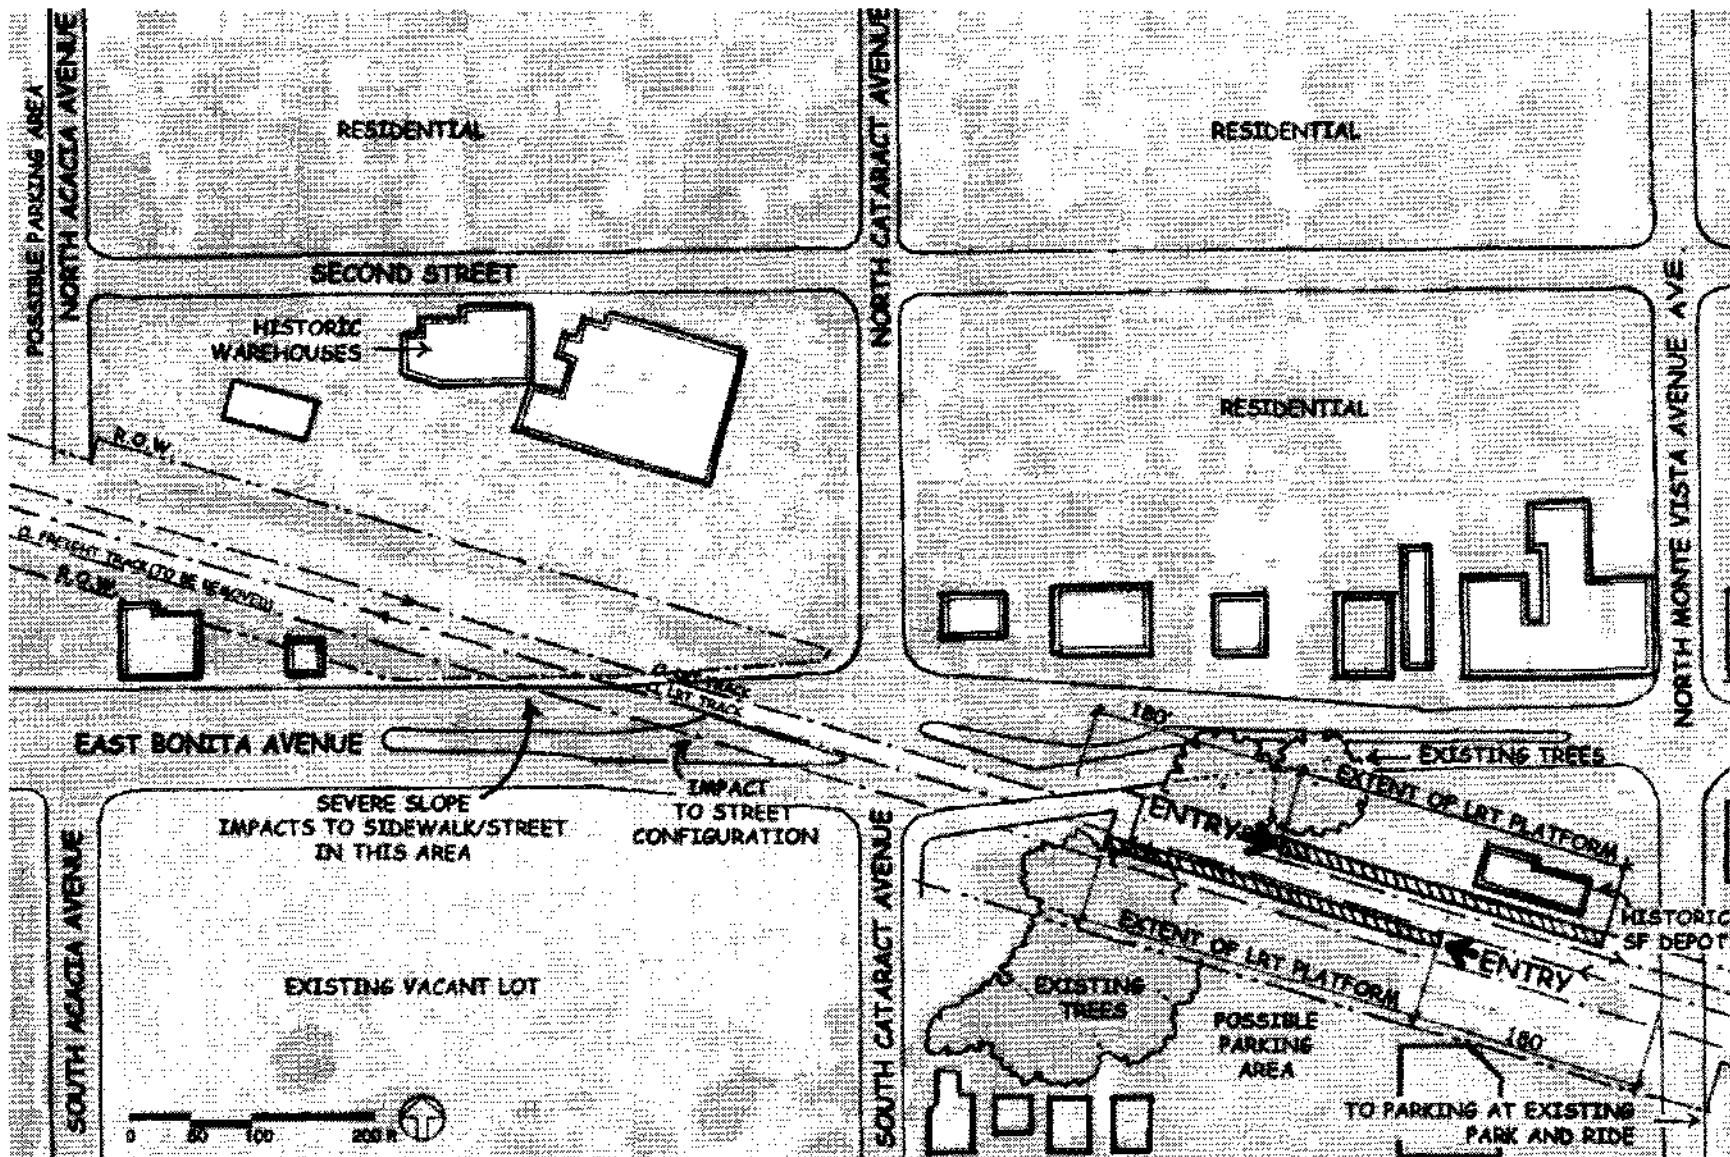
Site Plan: City of San Dimas Station, 2-Track Alternative
